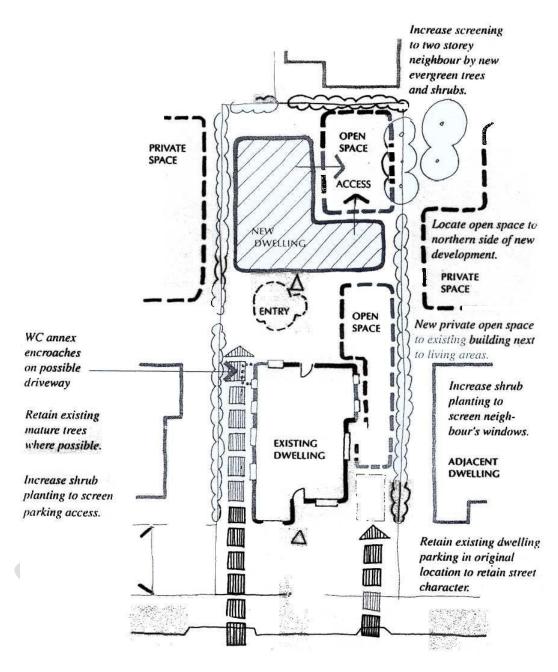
PRIVACY AND NOISE IS A KEY CONSIDERATION AT THE SITE PLANNING AND LAYOUT STAGE
